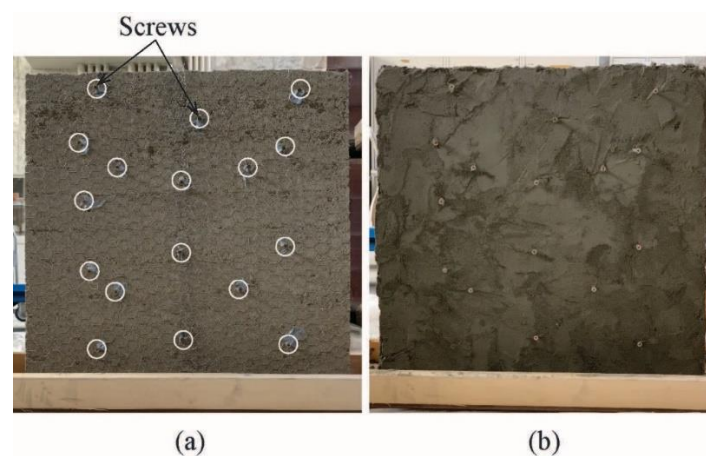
Retrofitting details: (a) Fixation of mesh and screws; (b) Final view after plastering.
